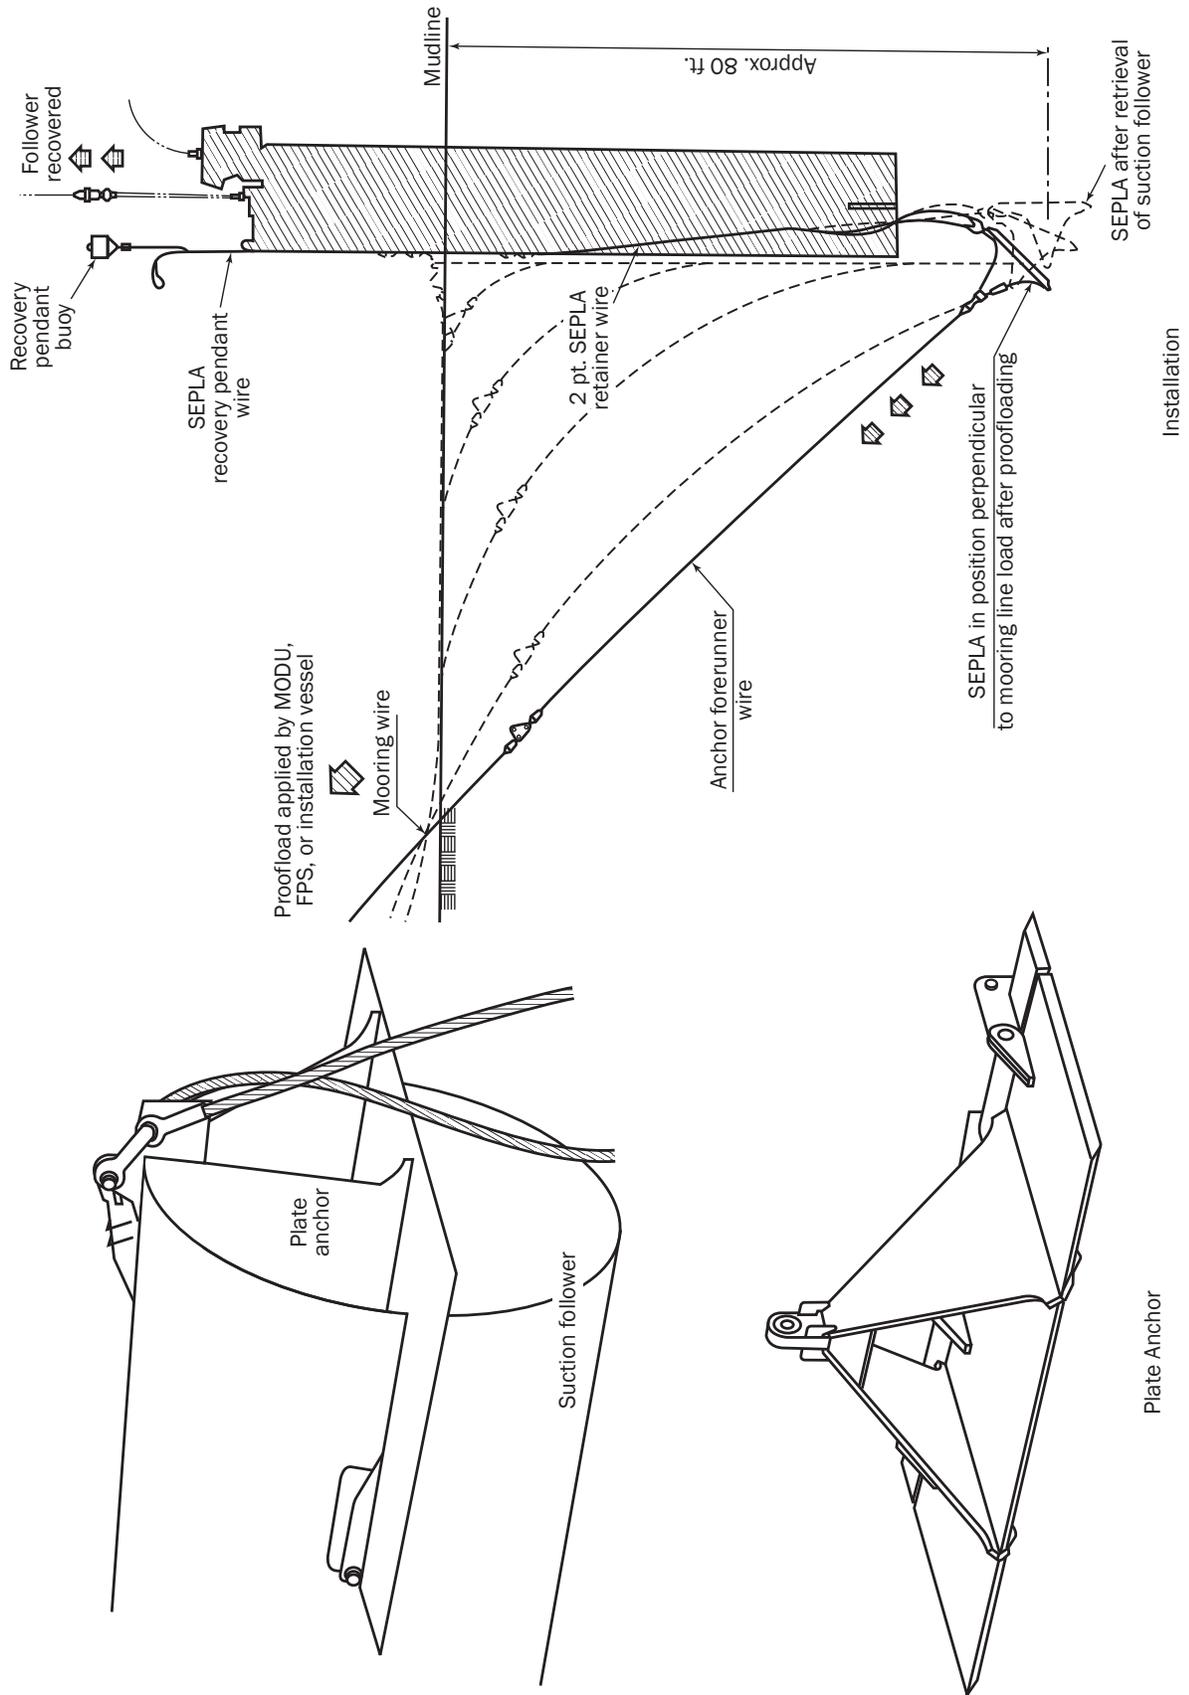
Suction Embedded Plate Anchor (SEPLA)
